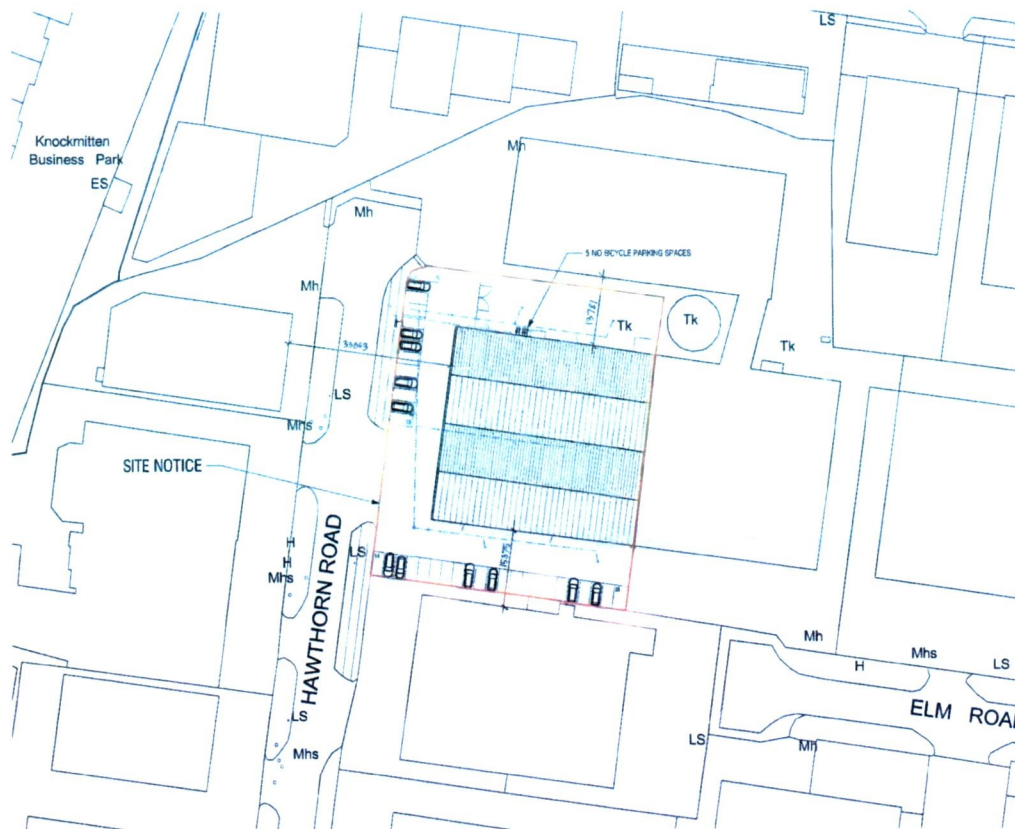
Extract of the Layout Plan of the development under Reg. Ref.: SD19A/023005
